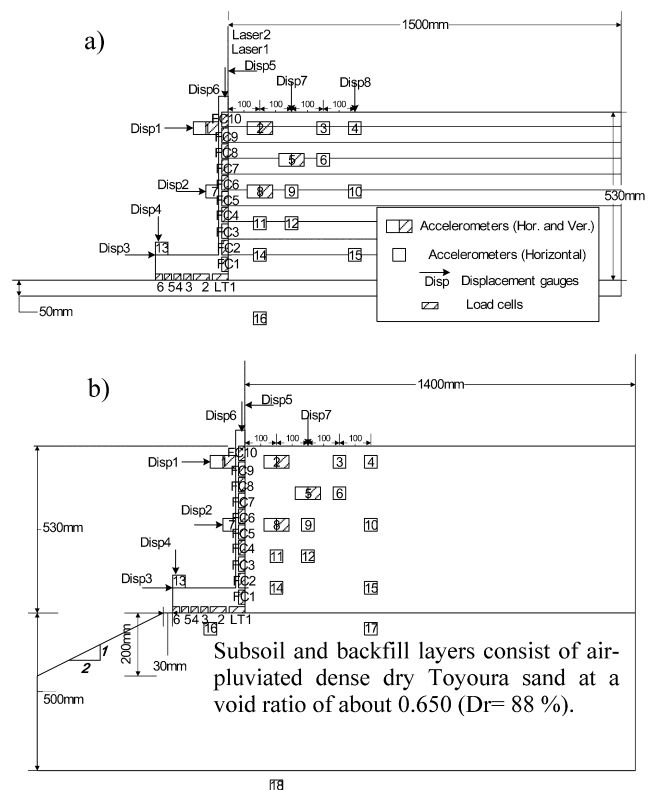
Typical cross-section of gravity type retaining wall models; a) with 5 cm-thick level ground and b) with 50 cm-thick sloped ground.
